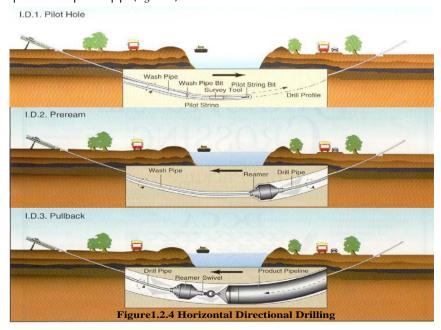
Horizontal Directional Drilling (Opening of the guide hole, expanding the hole and pulling the Pipe) [10]
